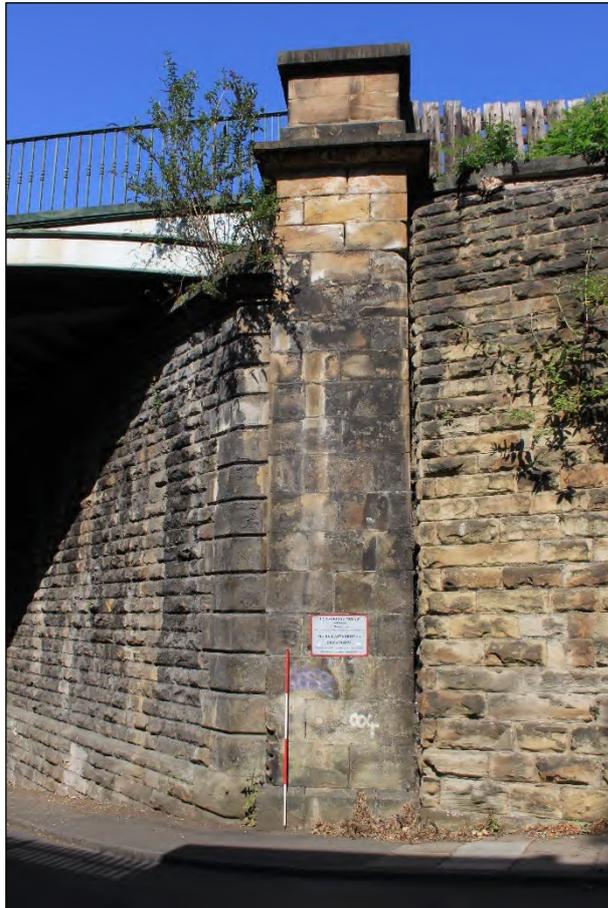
Detail of southern extent of east elevation showing 'demi-acorn' finial, 2m scale (IMG\_1027)
